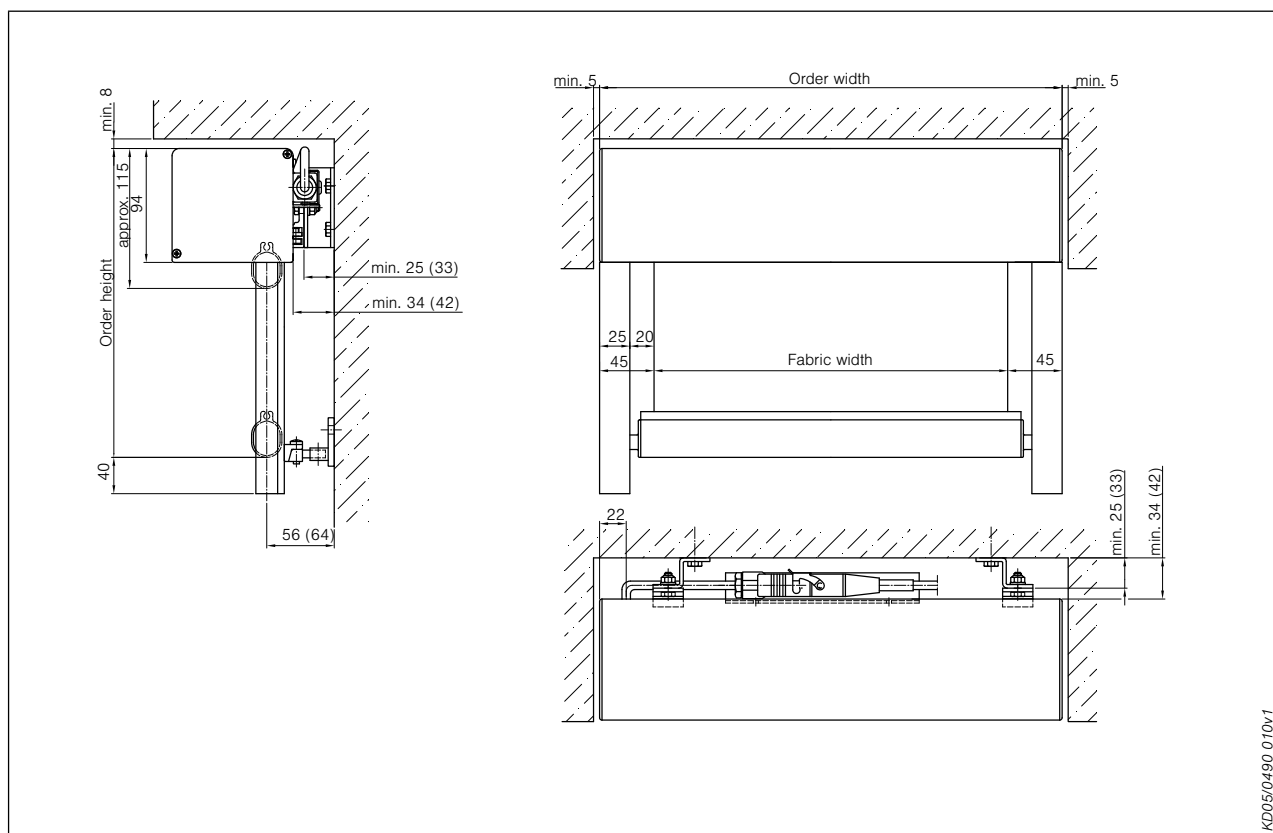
Individual unit, left rolling blind (also available as right rolling blind), wall installation, guide rail, with cable exit at the back
